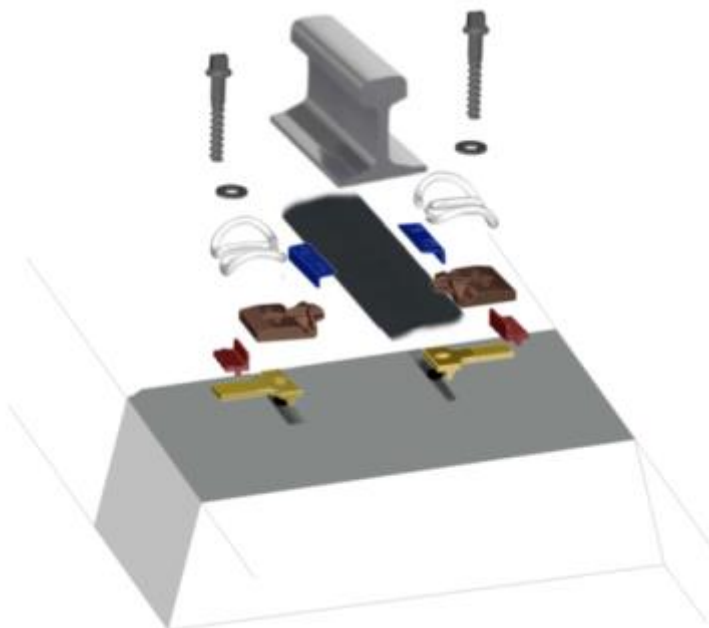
NEW L-TRACK FASTENING SYSTEM
